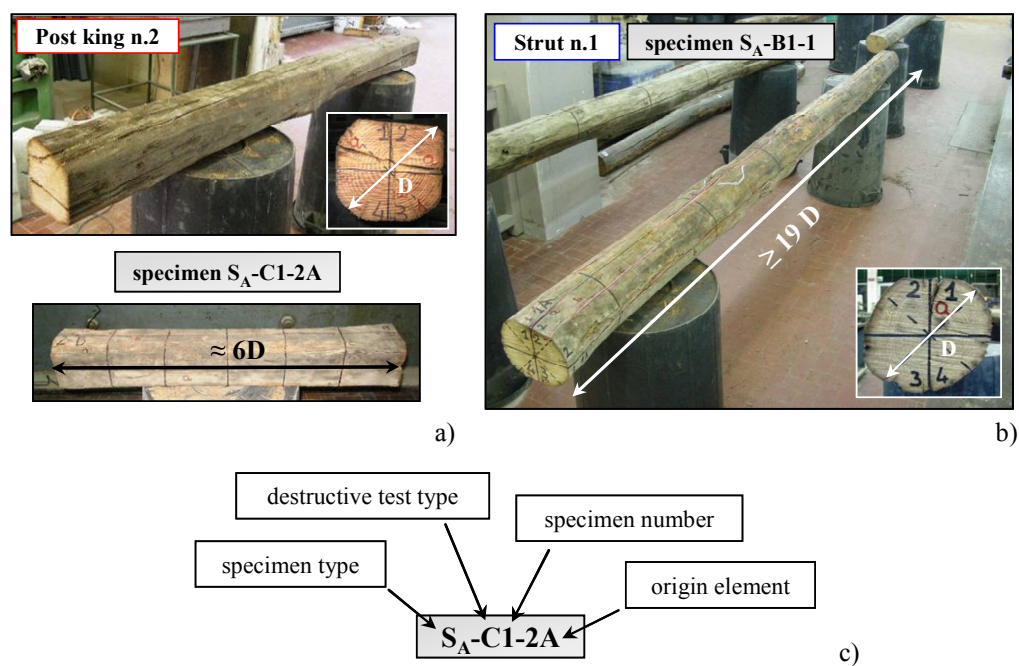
Tested specimens features – Structural elements in actual dimensions:
